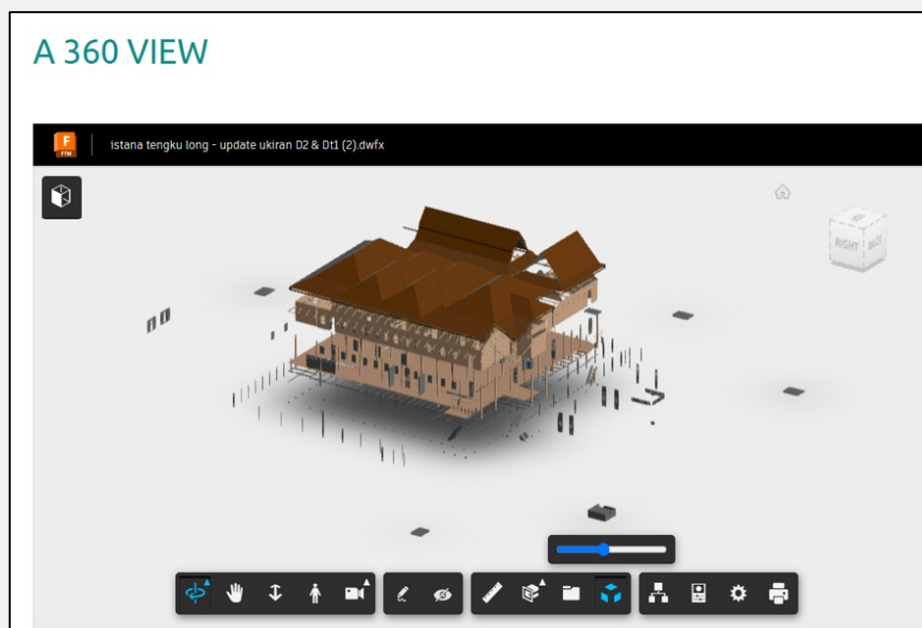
Exploded model of Istana Tengku Long (Terengganu)
